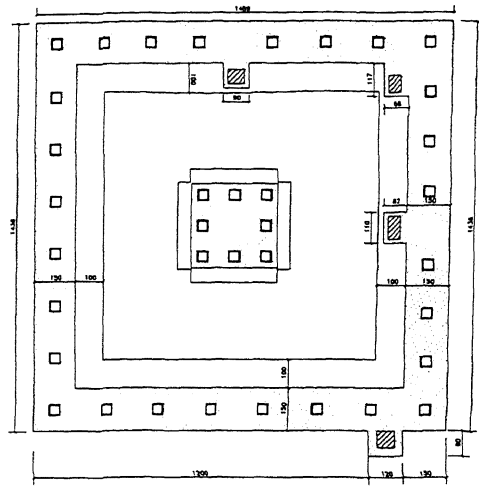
Plan of the new foundation structure and location of the elastomeric pads.
